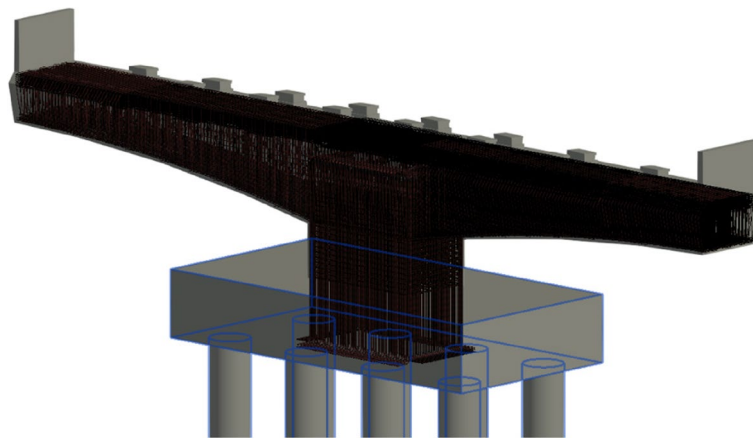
Substructure reinforcement (focusing on pier and hammer head)
